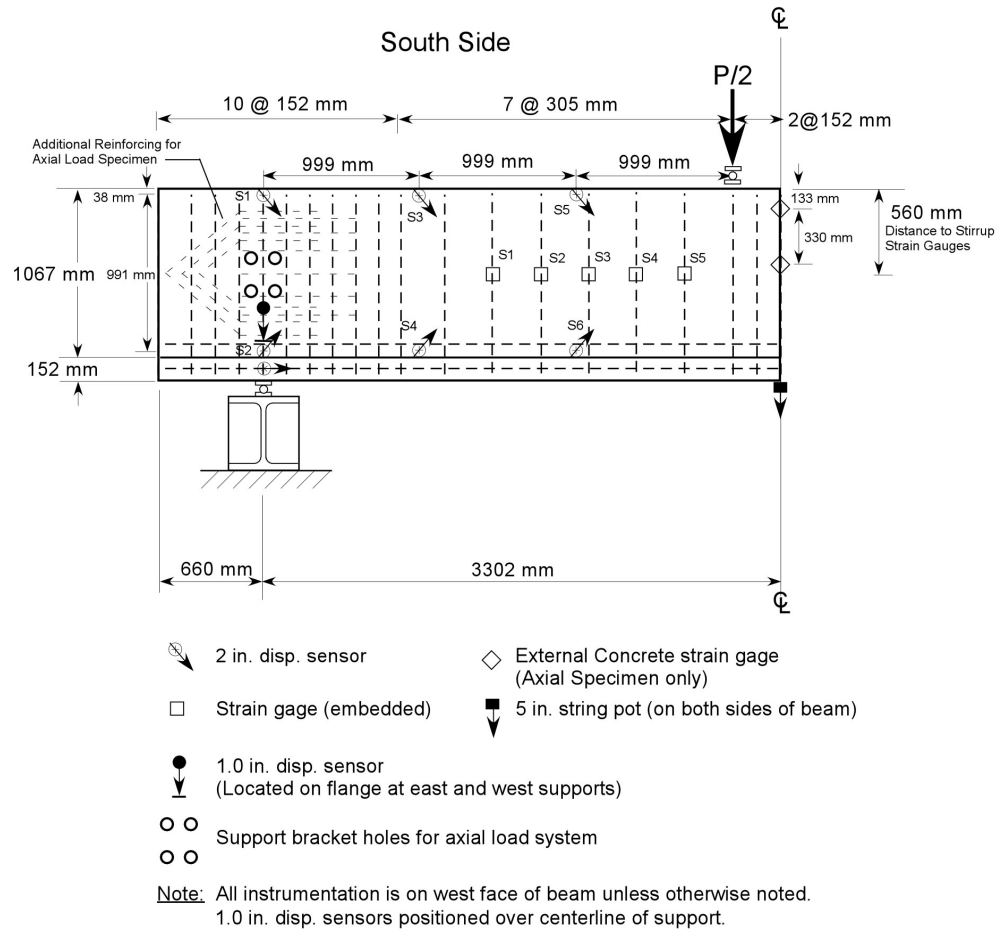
Specimen reinforcing details and typical instrumentation schematic.
